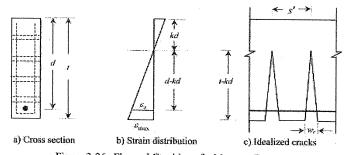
Flexural Cracking of a Masonry Beam
